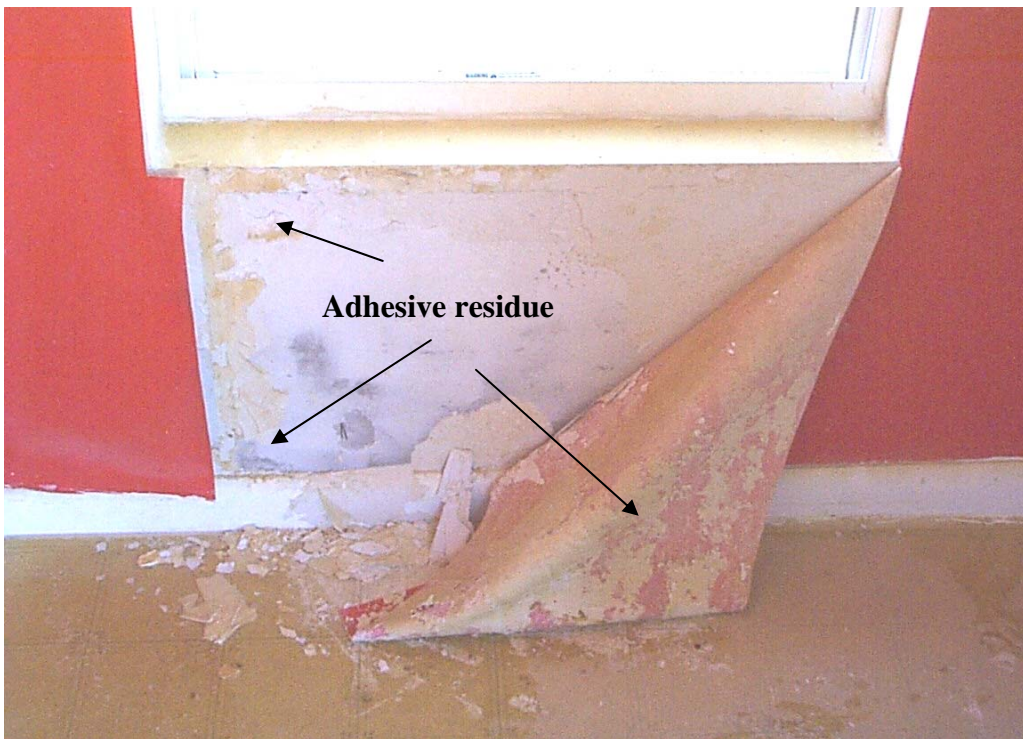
Module C-1 (Wall 1) Post-flood, Day 8 (before washing). Vinyl wall covering debonded and gypsum wallboard paper facing delaminated.
